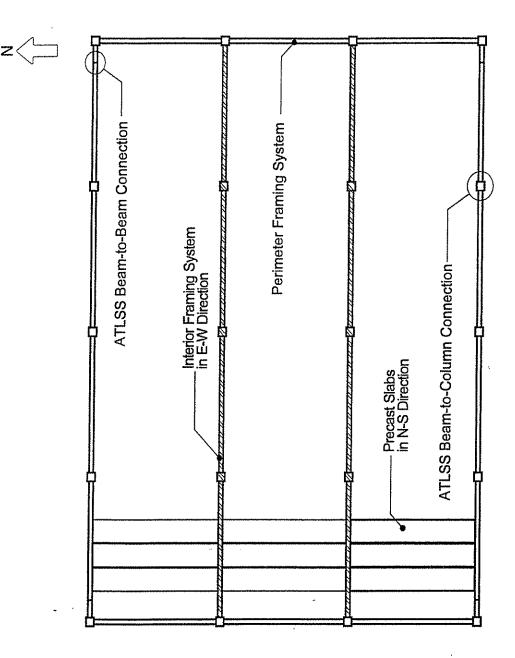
Typical Floor Plan of a Structure Using Three Dimensional APC System (without Wall System)
